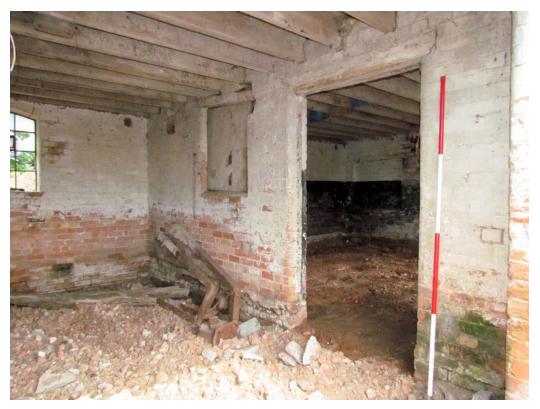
View Across Bays 1 and 2, Looking East (Scale = 2m).
